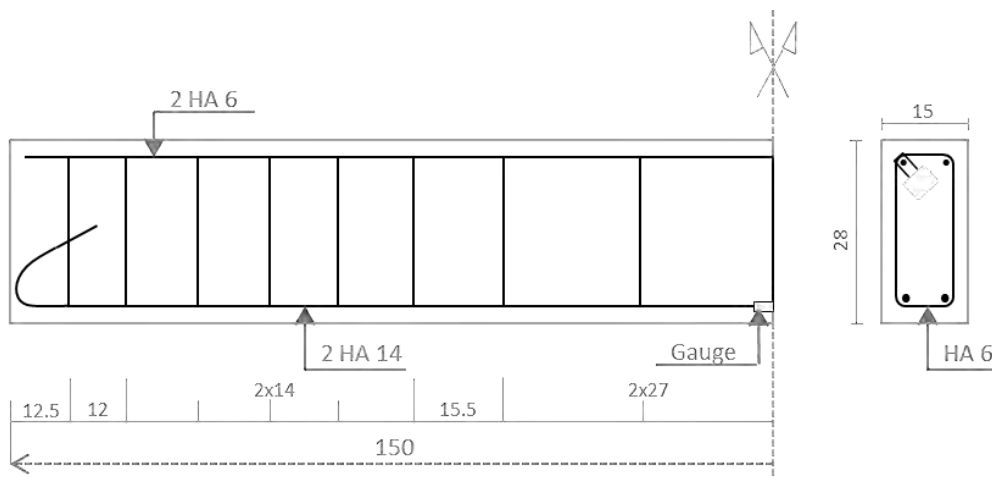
Lay-out of the reinforcement (all dimensions in mm) for a half-beam.
